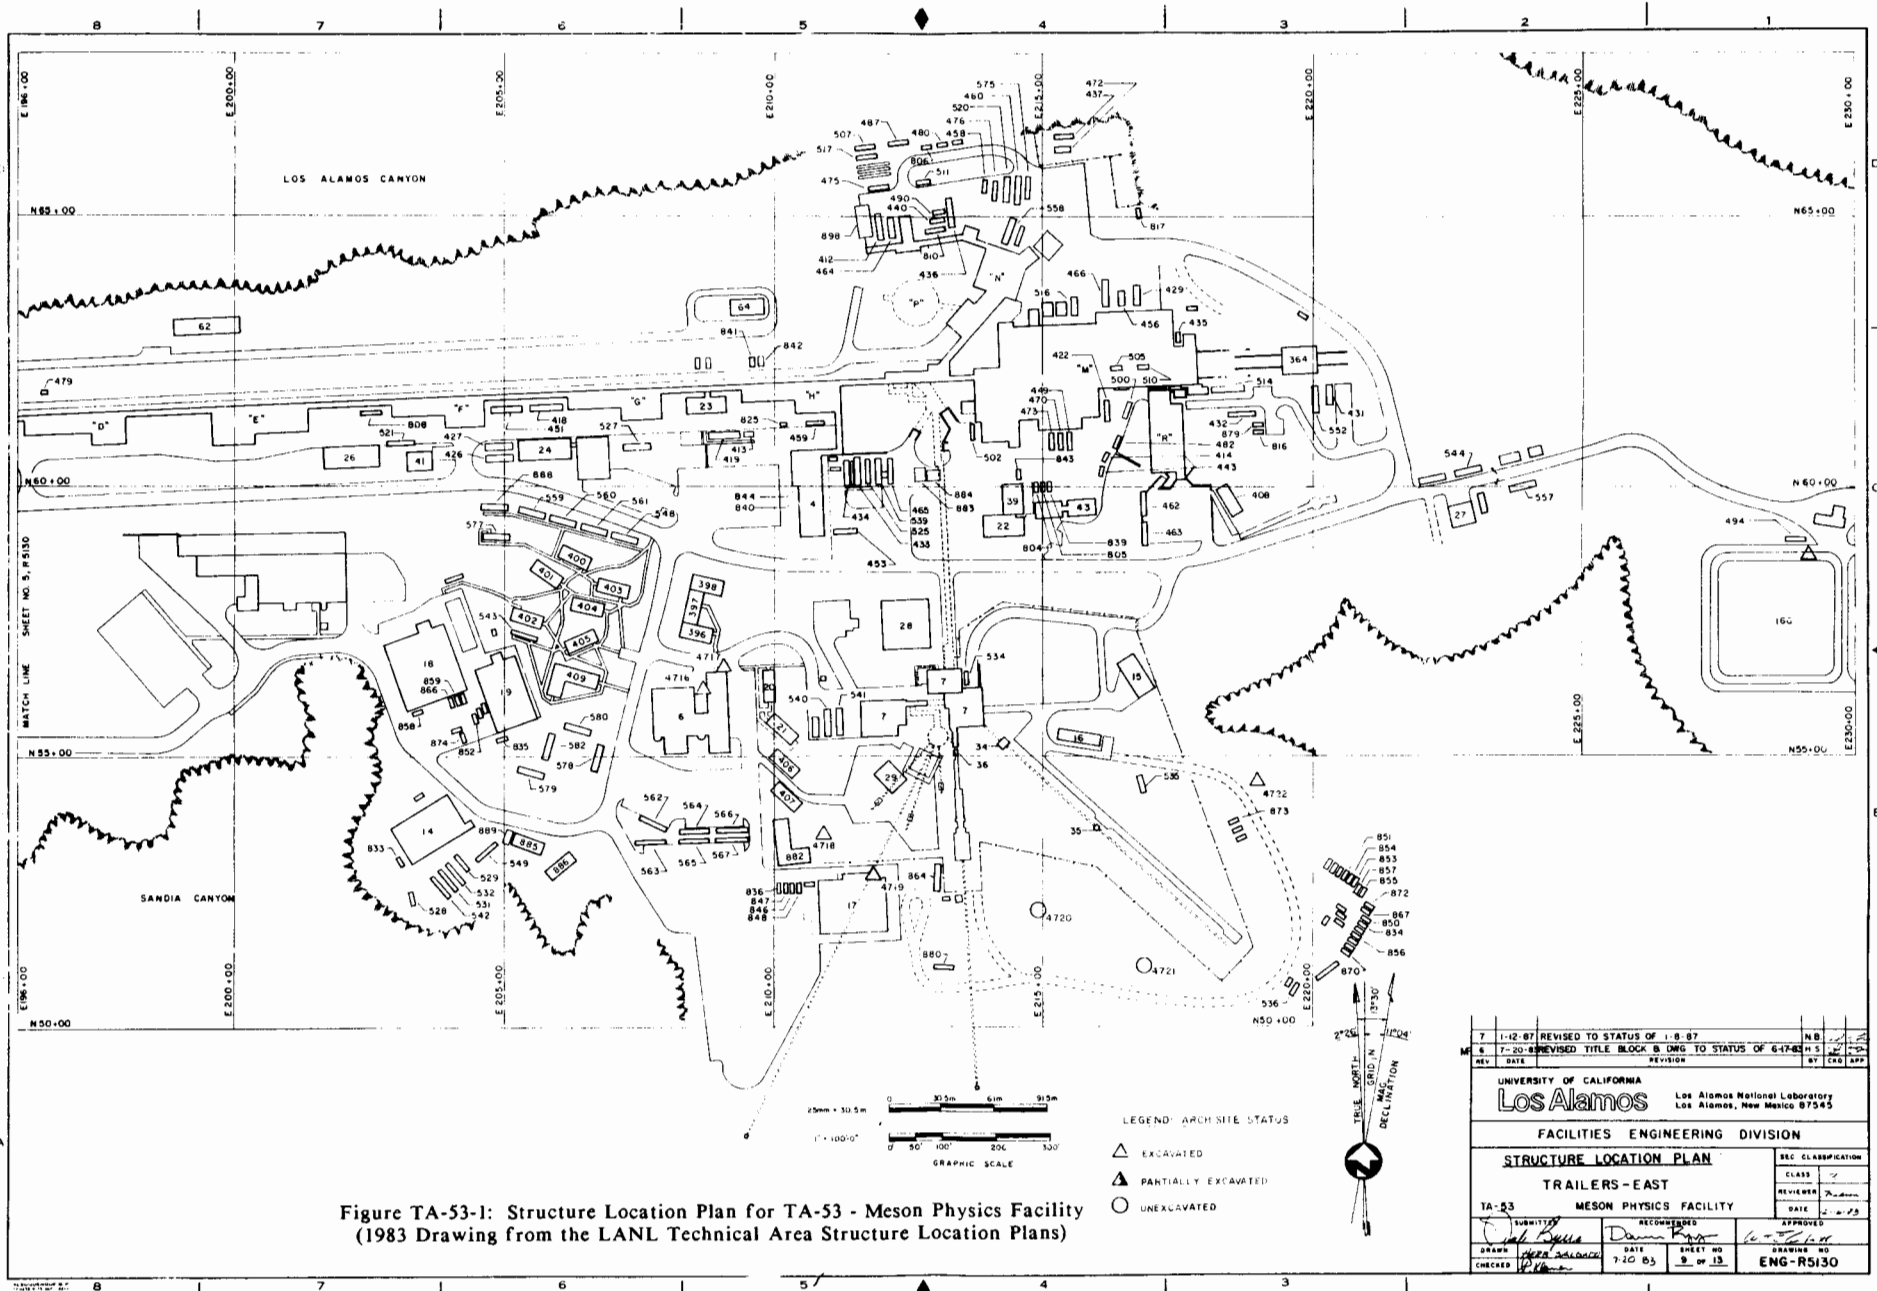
Structure Location Plan for TA-53 - Meson Physics Facility (1983 Drawing from the LANL Technical Area Structure Location Plans)
